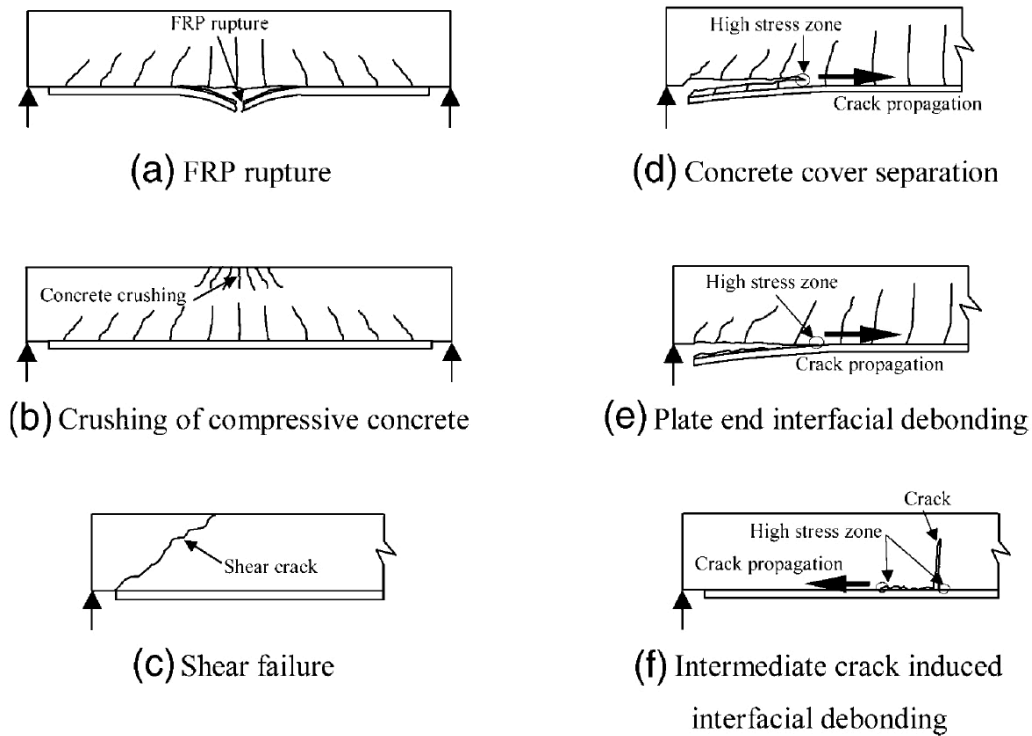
Failure modes of FRP-strengthened concrete beams (Smith and Teng, 2002)
